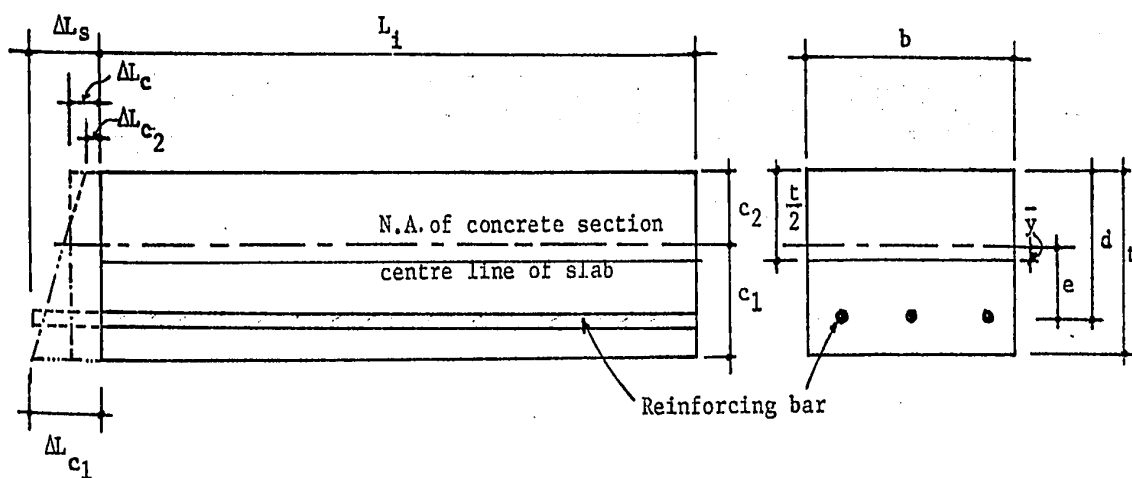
UNSYMMETRICALLY REINFORCED CONCRETE SLAB
